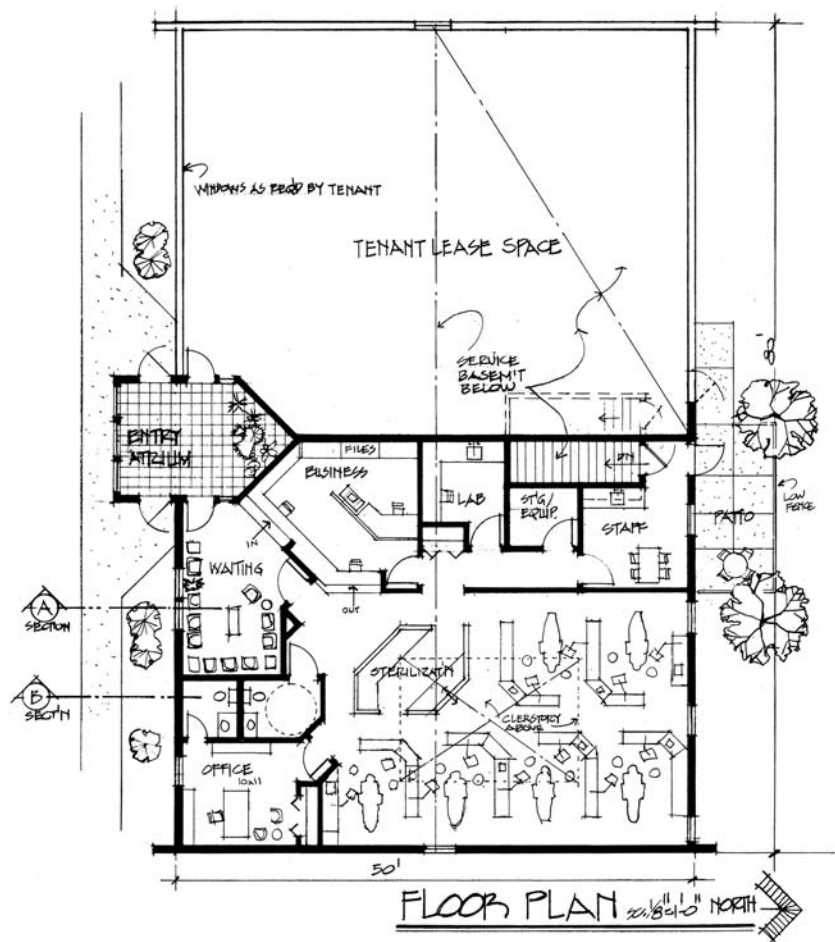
Preliminary floor plan of a dental office within a small medical building. At this stage, drawings can indicate walls, openings, spaces, furniture, and other details.
